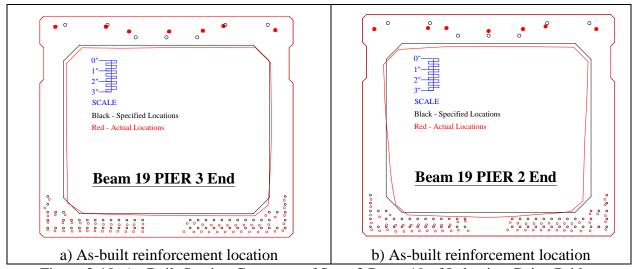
As-Built Section Geometry of Span 3 Beam 19 of Lakeview Drive Bridge
